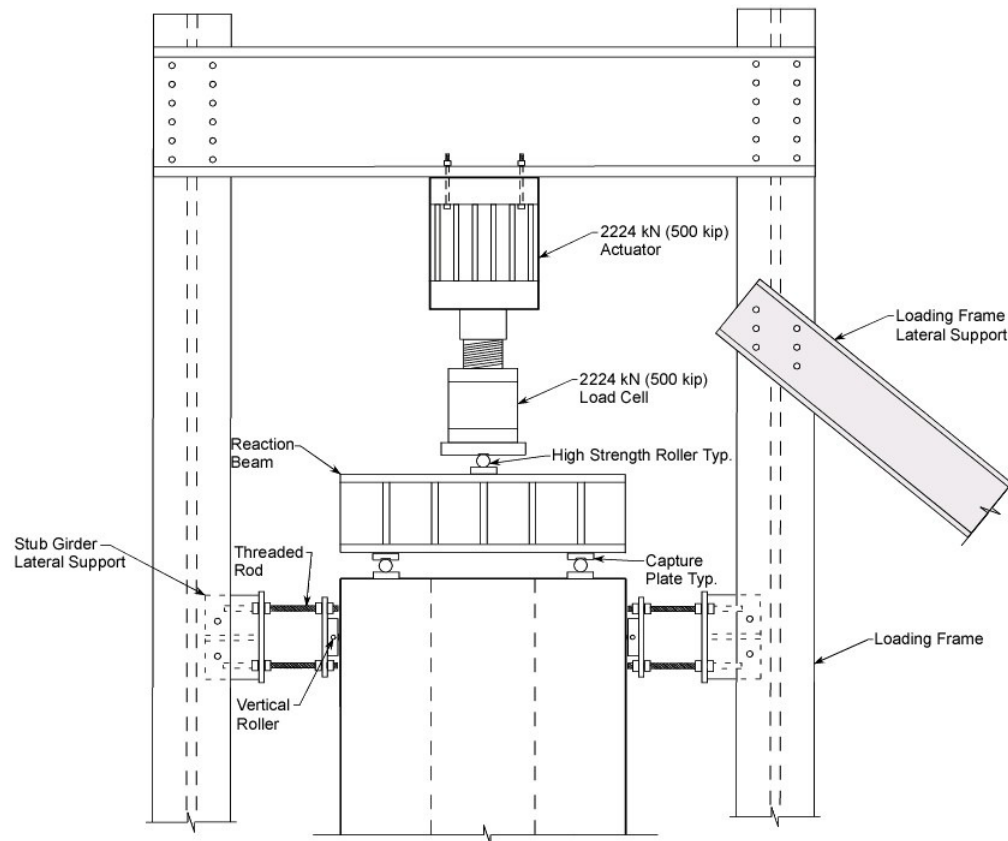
Bent cap indirect loading at stub girder location.
